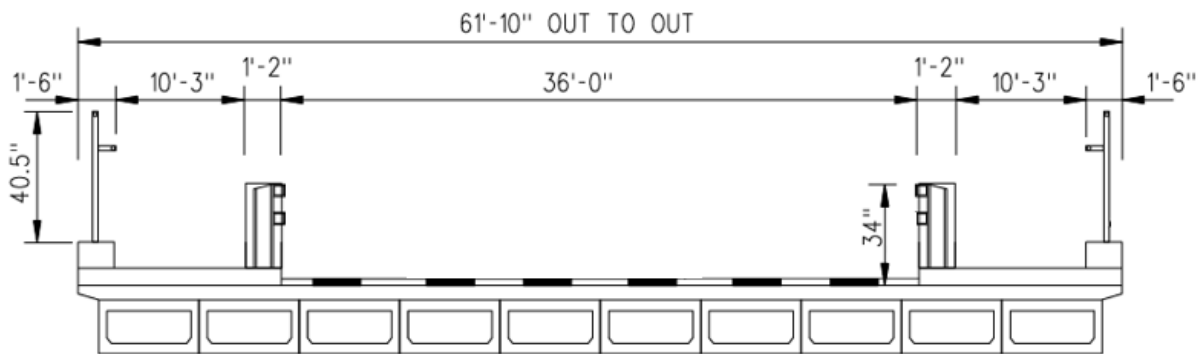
Cross-section view of concrete box girder structure with sidewalks on both sides (Example 2)
